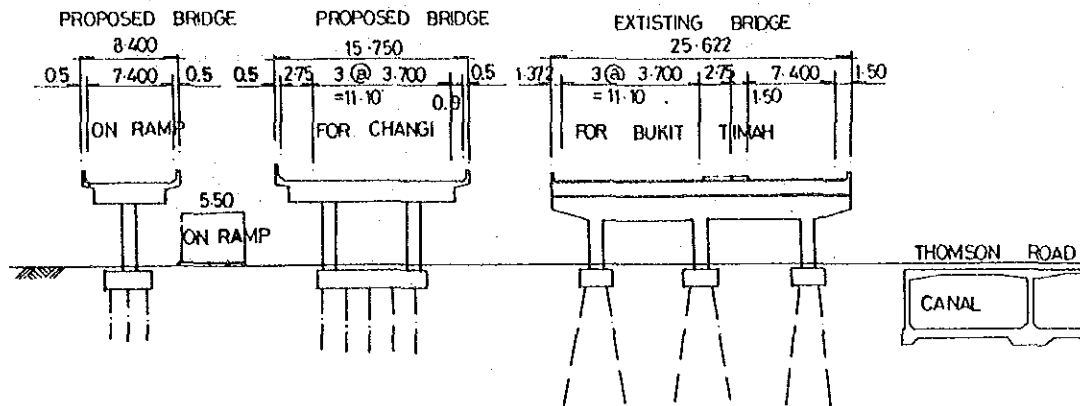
PIE Thomson IC : Widening plan by viaduct works
